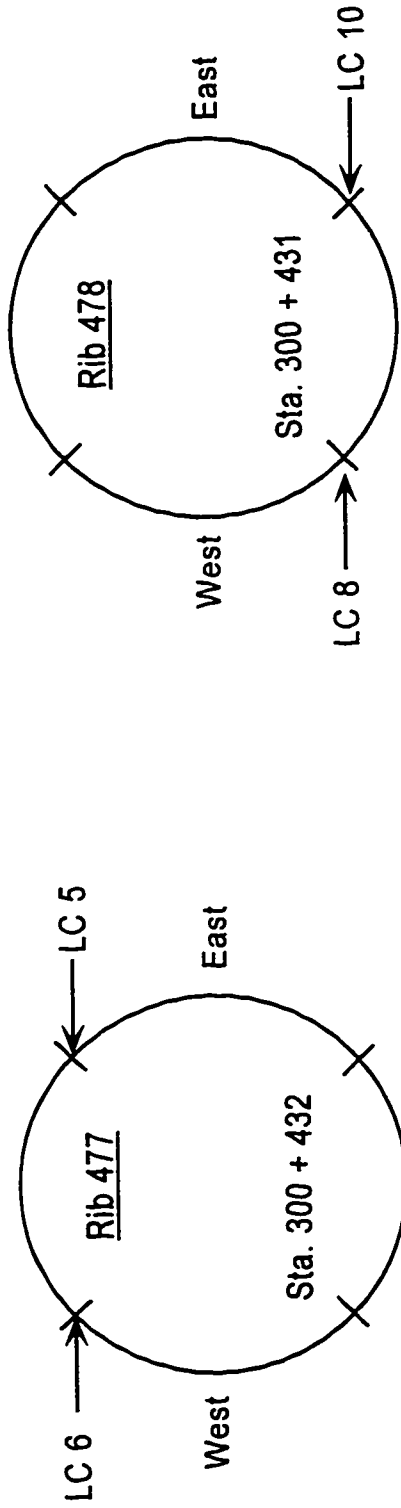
Load Cell Location of Section B2 of SLRT - Phase II Tunnel
